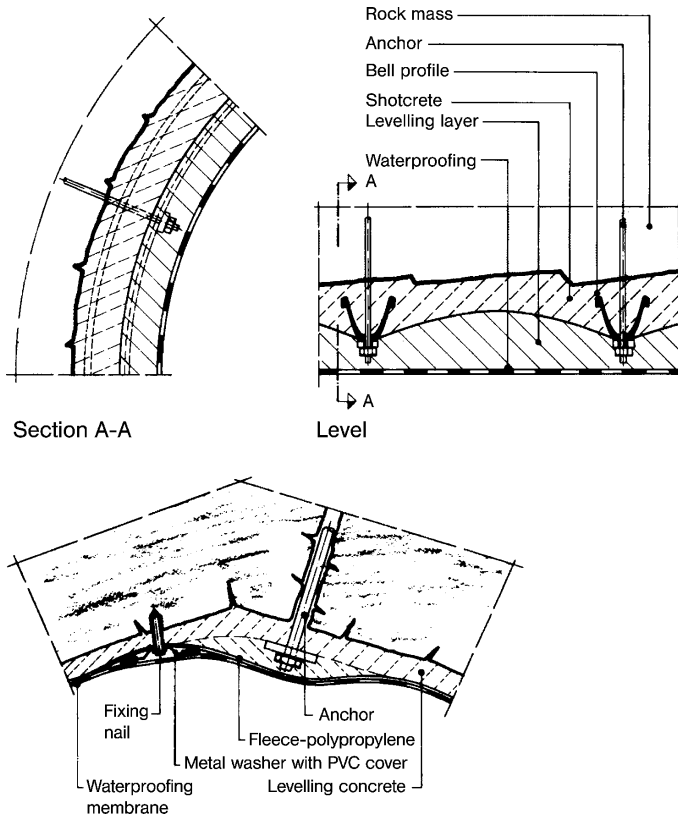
Waterproofing with levelling layer. Geometrically precise levelling layer (top), adapted levelling layer (bottom).
